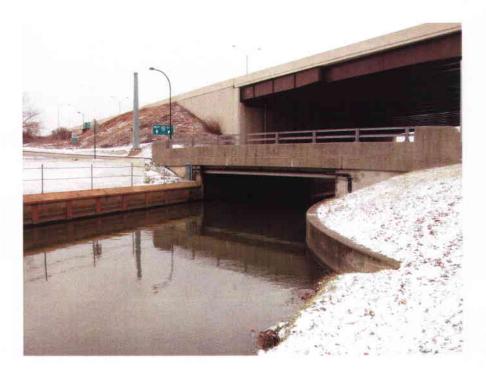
Downstream Side of 3rd Avenue Bridge (looking southeast)
